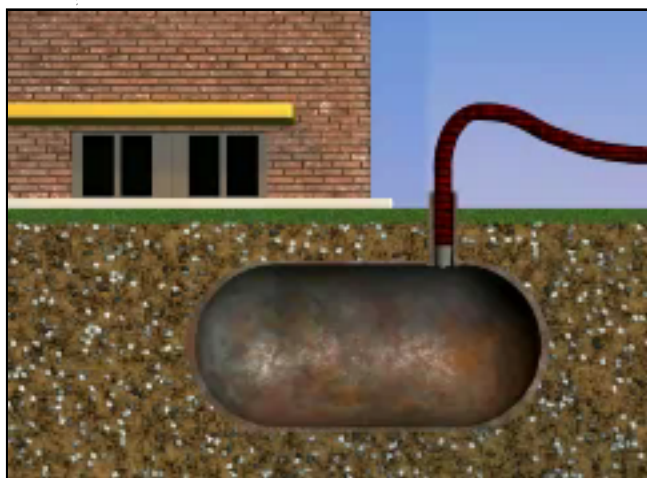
Filling abandoned underground fuel- or oil-storage tank with cellular concrete (click on picture to view video).
